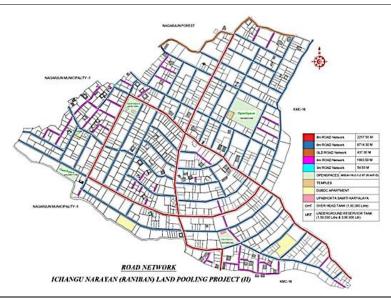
The layout plan for Ichangu Narayan land pooling project
